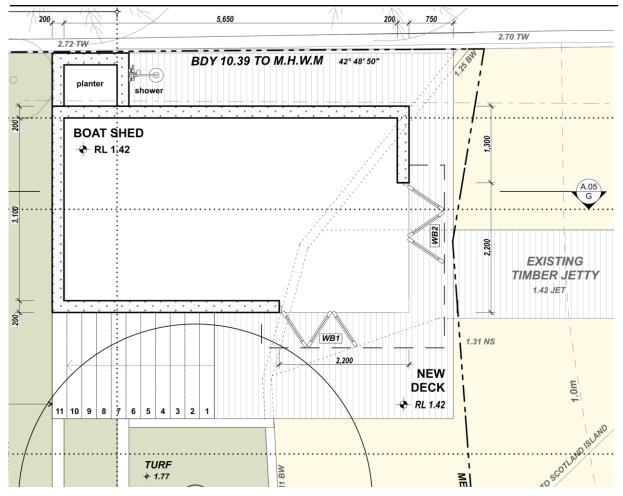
Plan View of Proposed Development (extract from drawings by Gartner Trovato Architects (2022, provided in Appendix B))
